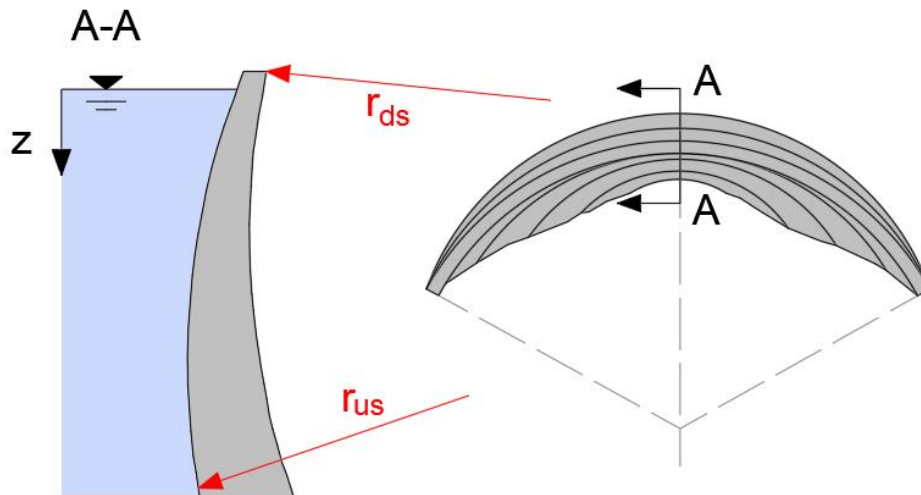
Double-curvature arch dam - layout and cross section, cf. [3]
